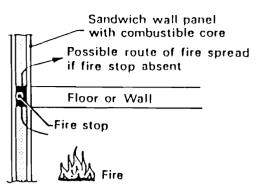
'Junctions between sandwich panels and fire separating walls or floors should always be fire-stopped....'
